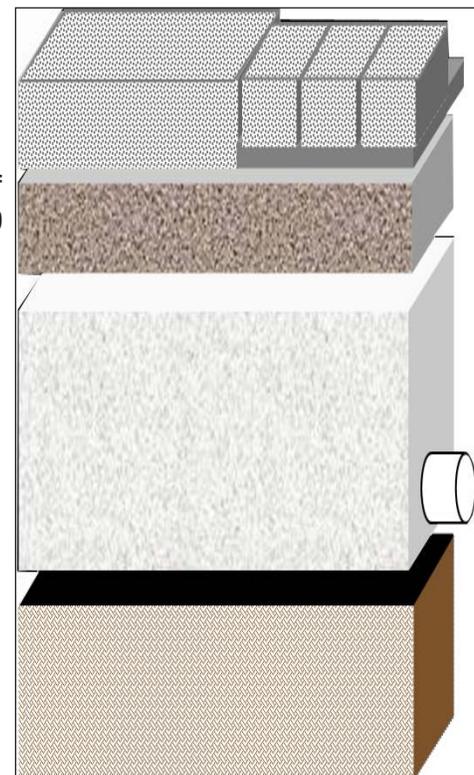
Types of materials used in infiltrating and closed permeable pavement systems.
